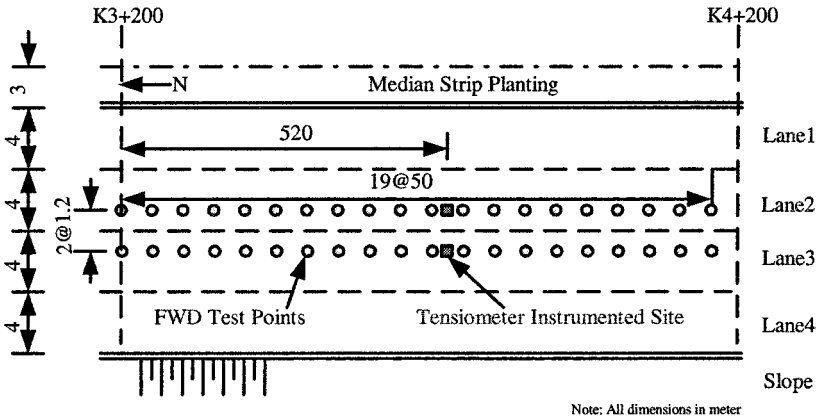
Plan View of Locations of FWD Test and Monitoring Sensors
